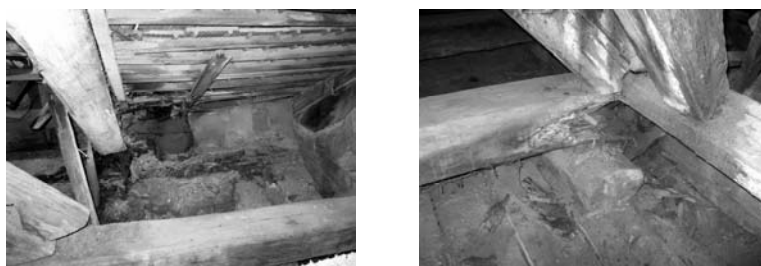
Destroyed parts in the bottom of gutter valleys due to fungi attack.
